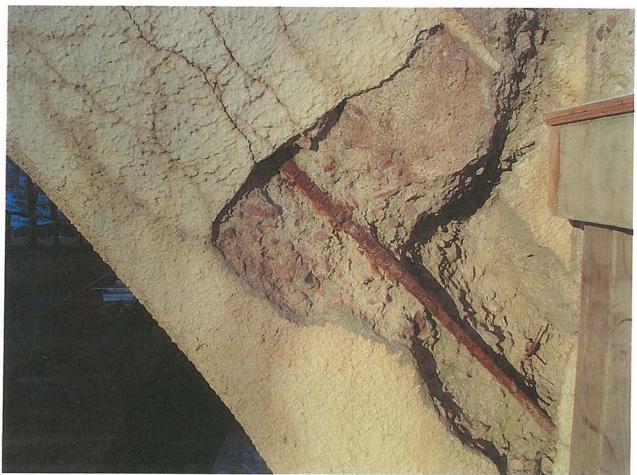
Exposed steel reinforcement bar used to connect the voltmeter during the corrosion potential survey. Image shows the bar prior to grinding away corrosion.
